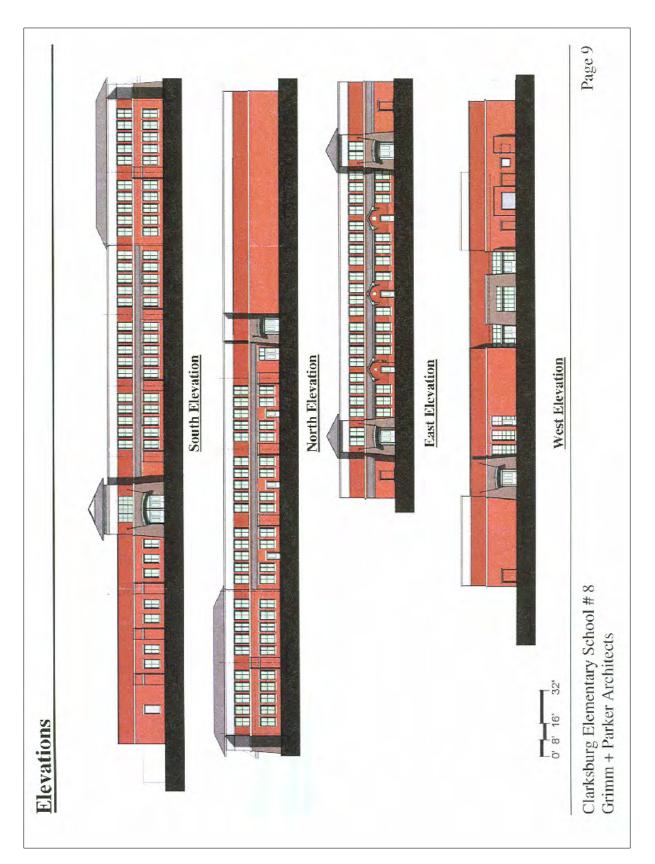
Elevations of Clarksburg Elementary School No. 8.
